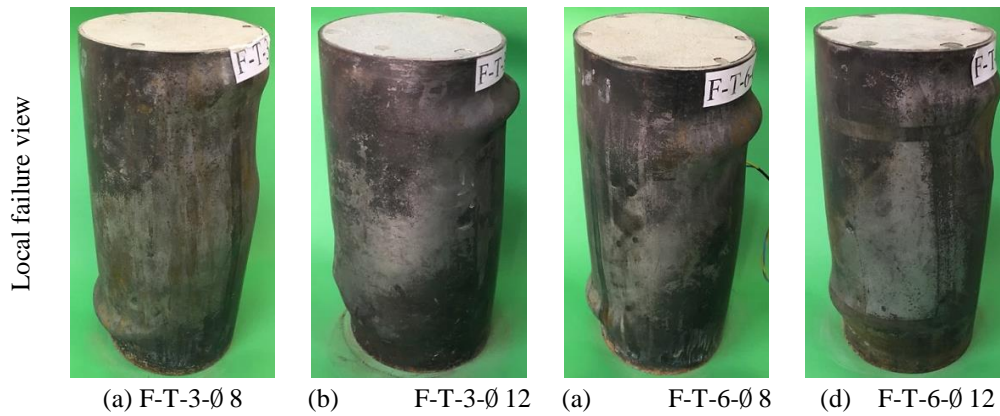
Failure modes of column specimens with 3.15 mm wall thickness exposed to the smouldering fire test after compression loading
